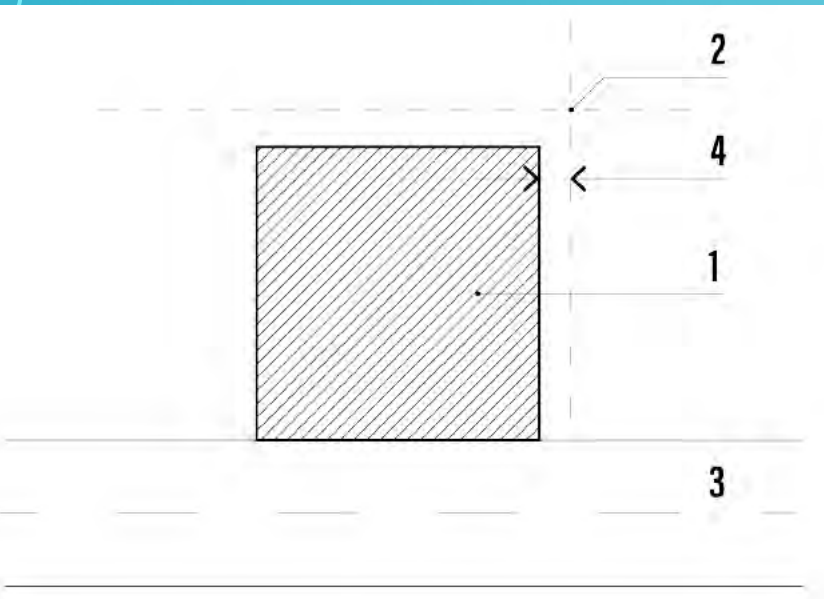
A plan of a building (1) within its boundaries (2) and on a street (3). On three sides the building is built back from the boundaries by the width of a seismic gap (4).
